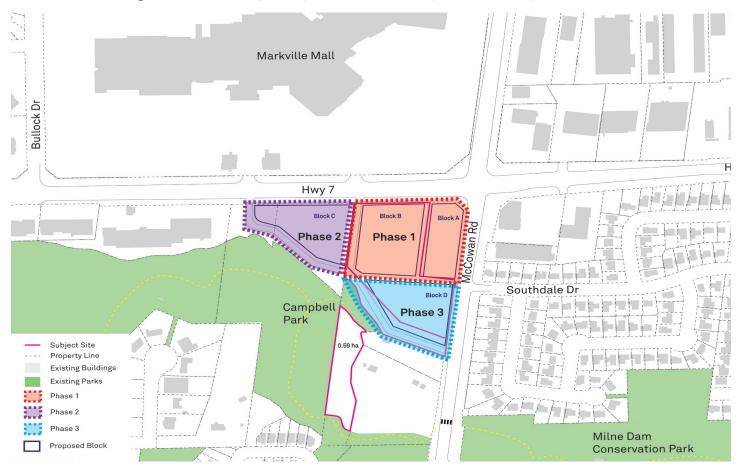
Phasing Plan for Block Plan Area (Brook McIlroy)
